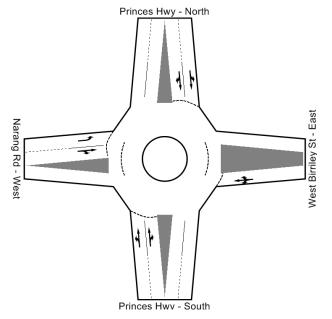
Princes Highway and Narang Road Existing and Required Future Layout for Option 1
